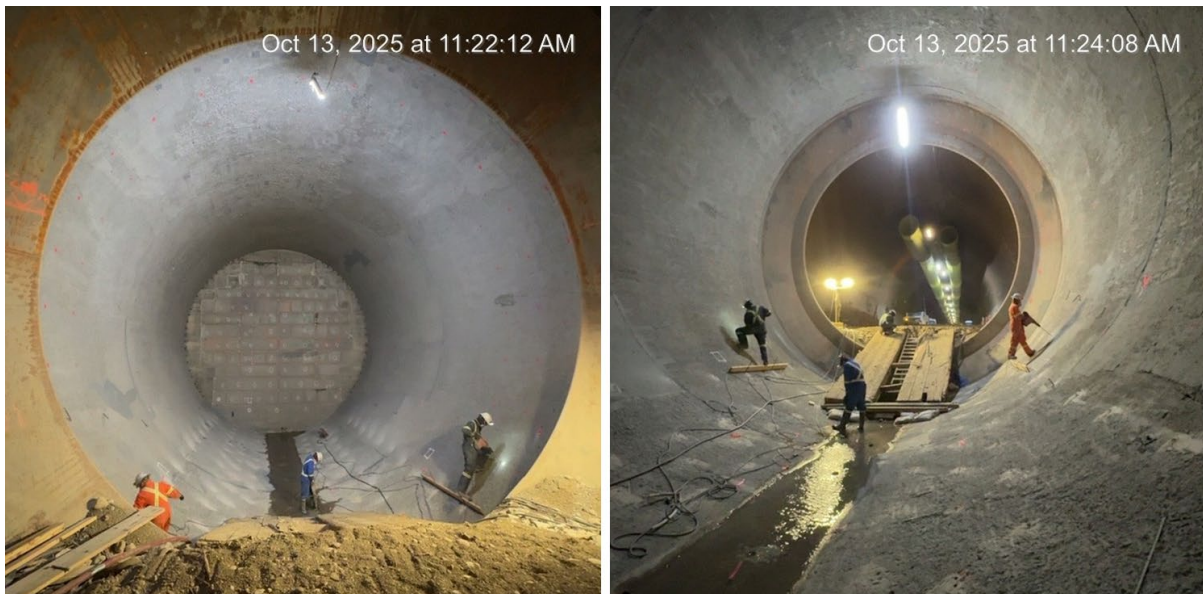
Overview of the Diversion Tunnel Downstream Portal (Left photo is looking upstream, the right photo is looking downstream) (October 2025)
